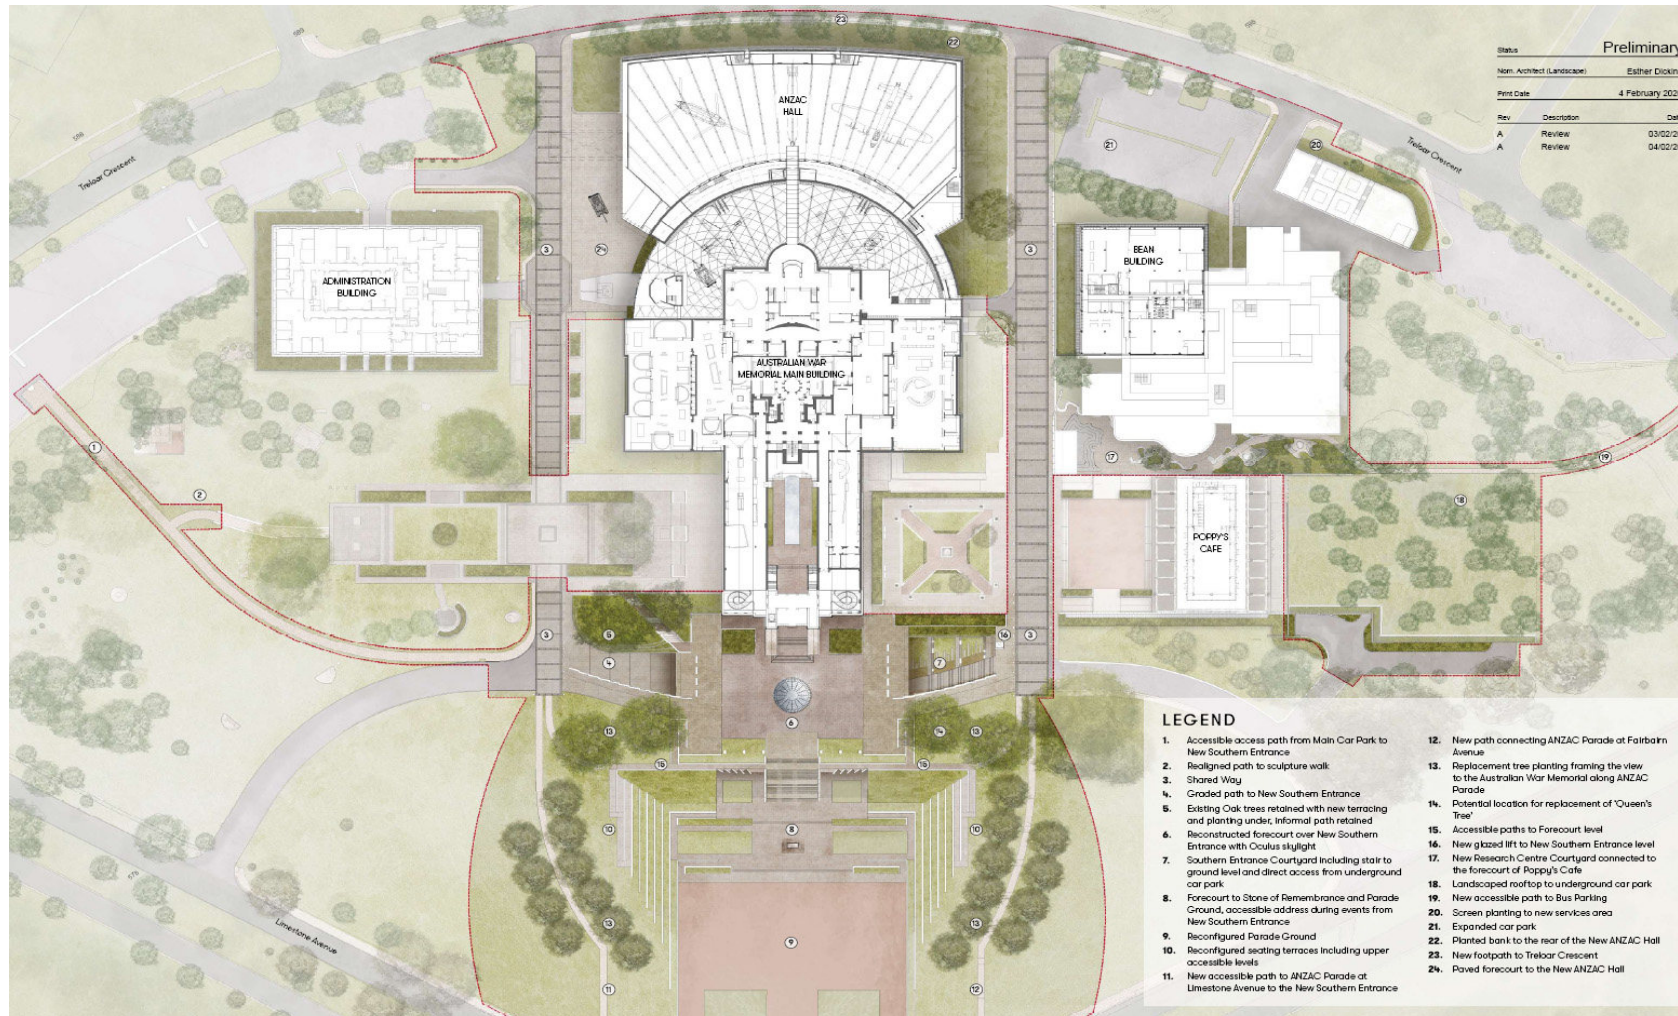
Site Plan – Anzac Hall & Glazed Link
